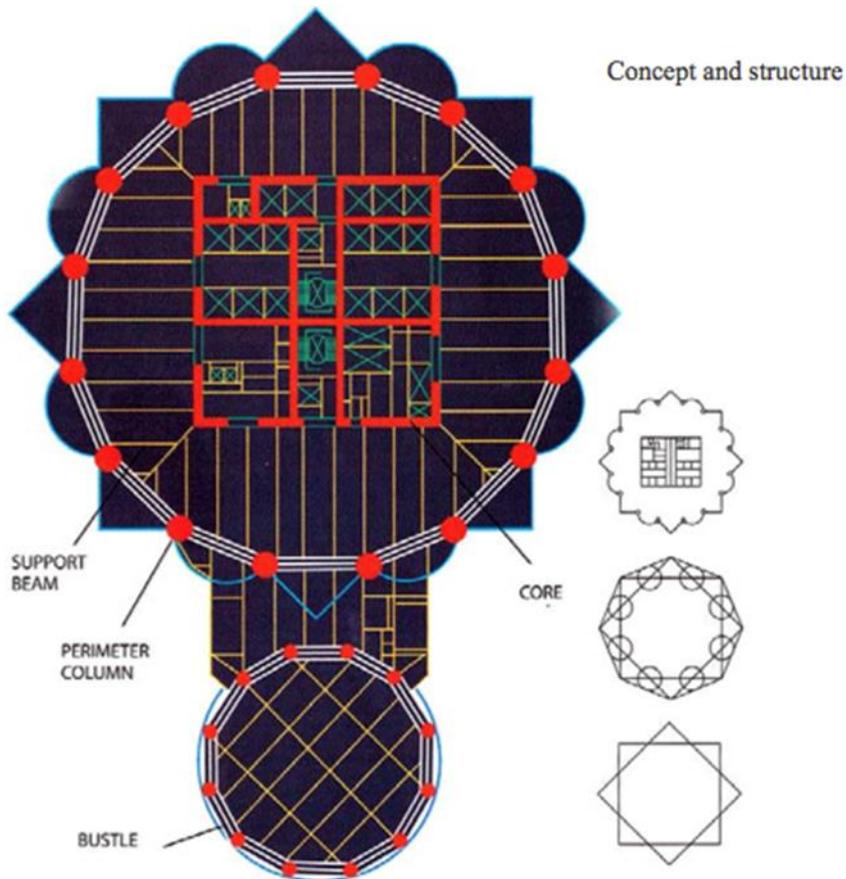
Petronas Tower- Characteristic Floor Plan Showing Concept and Structure [66]
